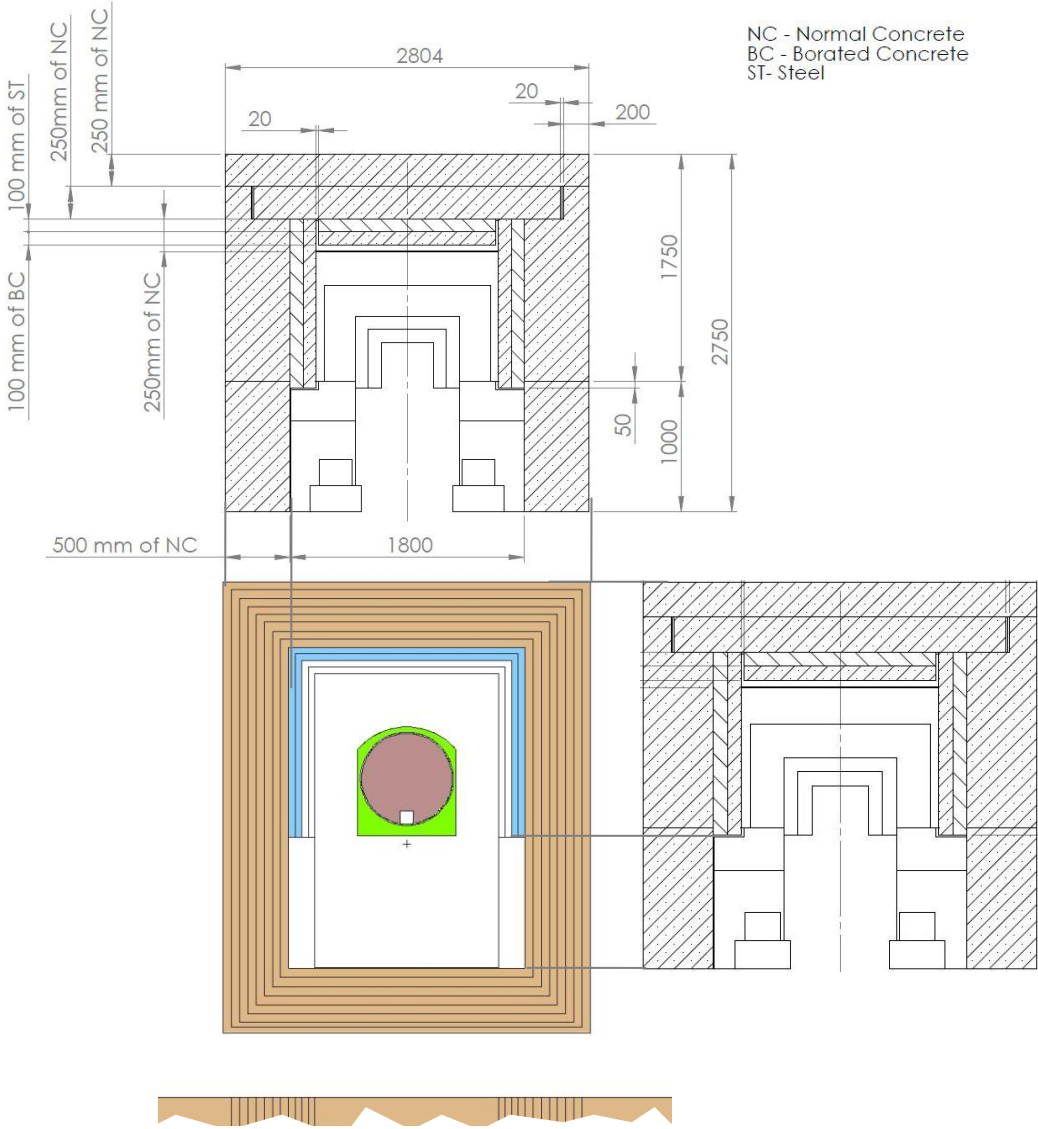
Vertical cut through the chopper pit. Top: Drawing; bottom: Monte Carlo model
